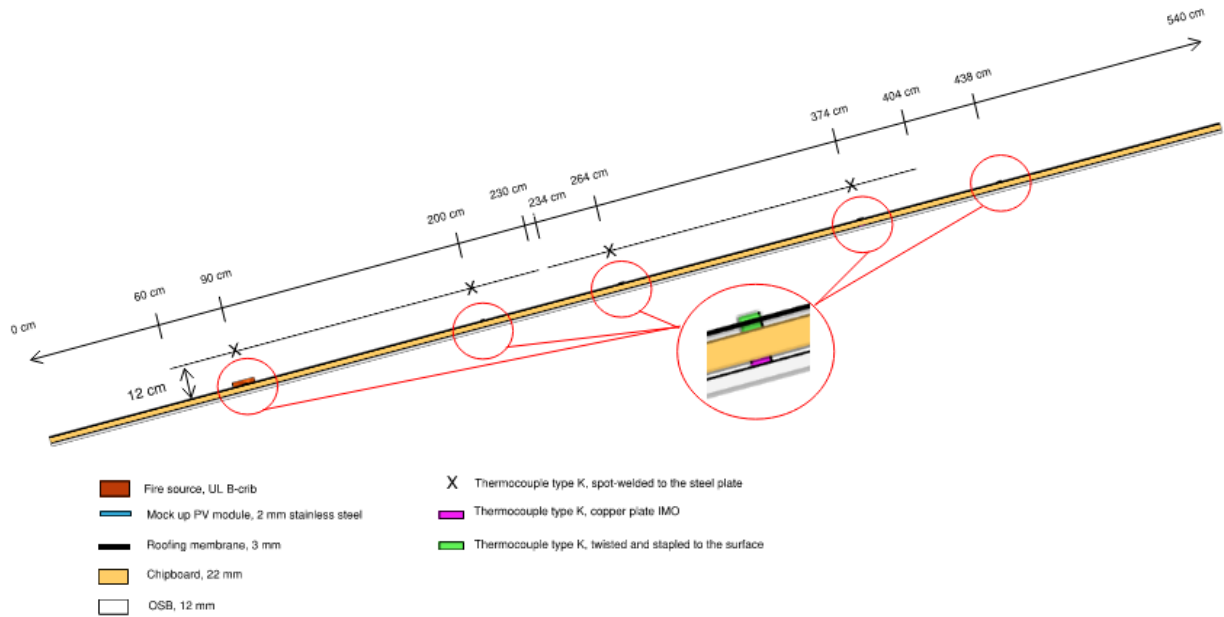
Section view of the center of the roof construction where the initial fire is located. The figure is a schematic illustration of the instrumentation and test setup for the full-scale experiment.
